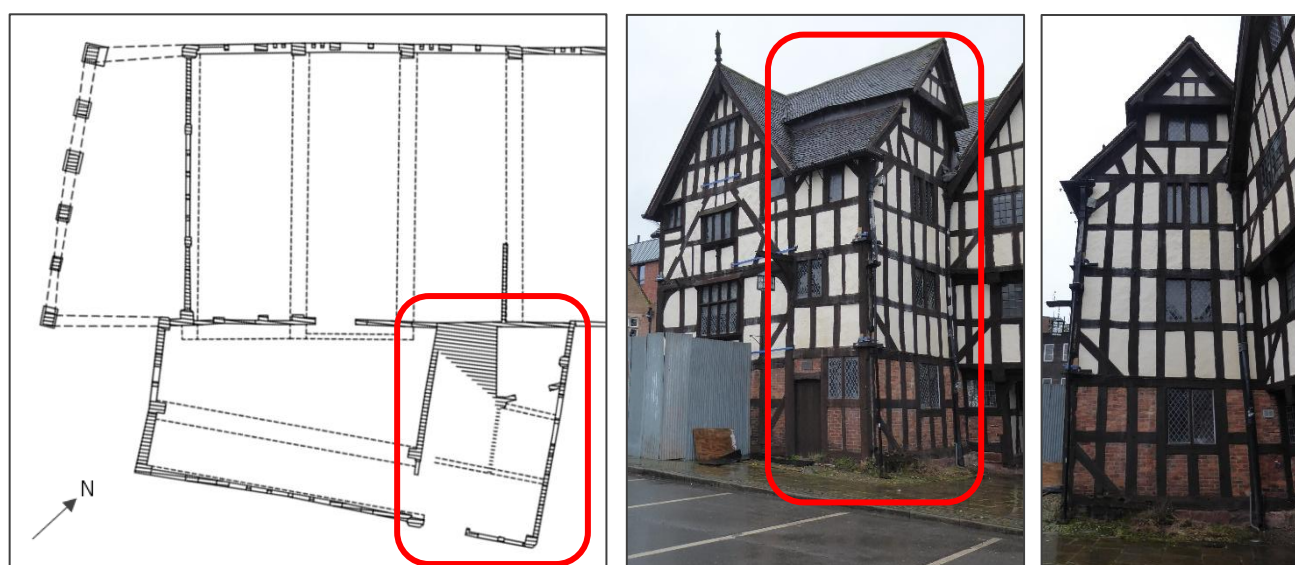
Left: A stair tower was added to the east wing in around 1641. The structure was built up against the east wing and warehouse wall and provided access into all levels of the warehouse via openings cut into it from the east wing. Right: North and East elevations show the overall form of the unusual roof structure which has a mini jettied gable and two side frames to raise its height (Images: Plan based on 2023 survey, not scaleable; Photographs: TDR Heritage Ltd 2023).
